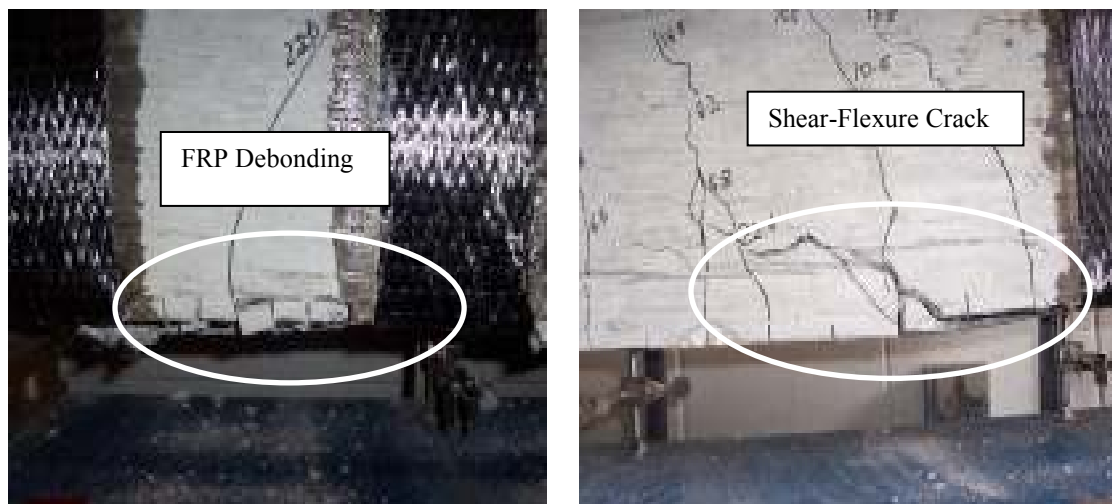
Typical Failure Mode for Specimens with Surface Cracks
